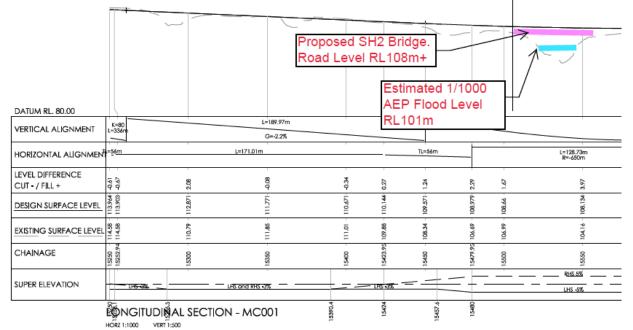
Extract from Preliminary Geometric Design Drawings – December 2021, Long Section
